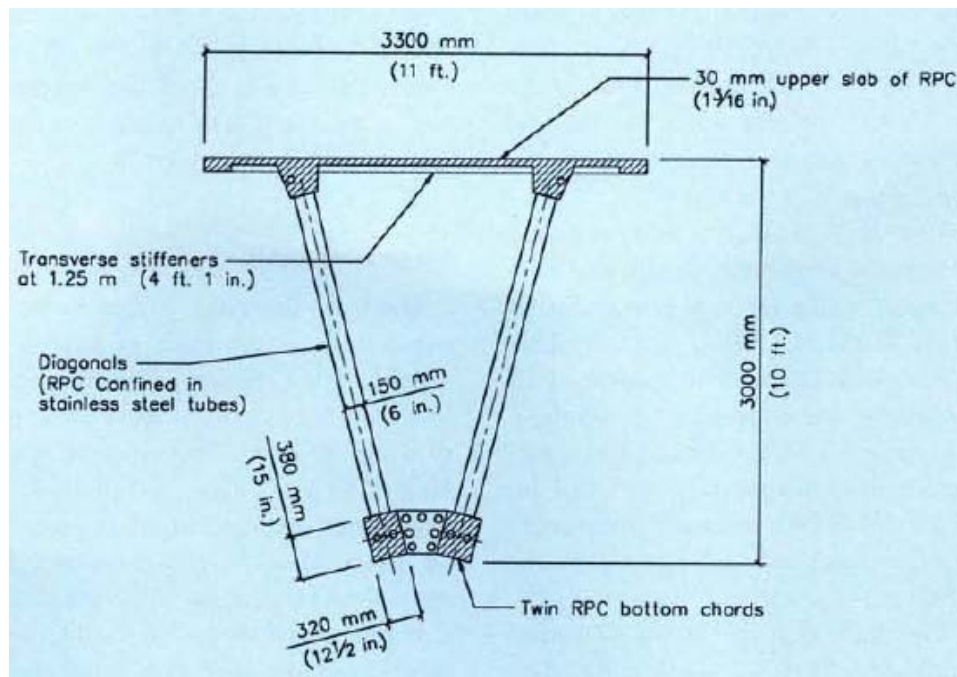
Cross-section of Sherbrooke bridge truss (Blais and Couture 1999)
